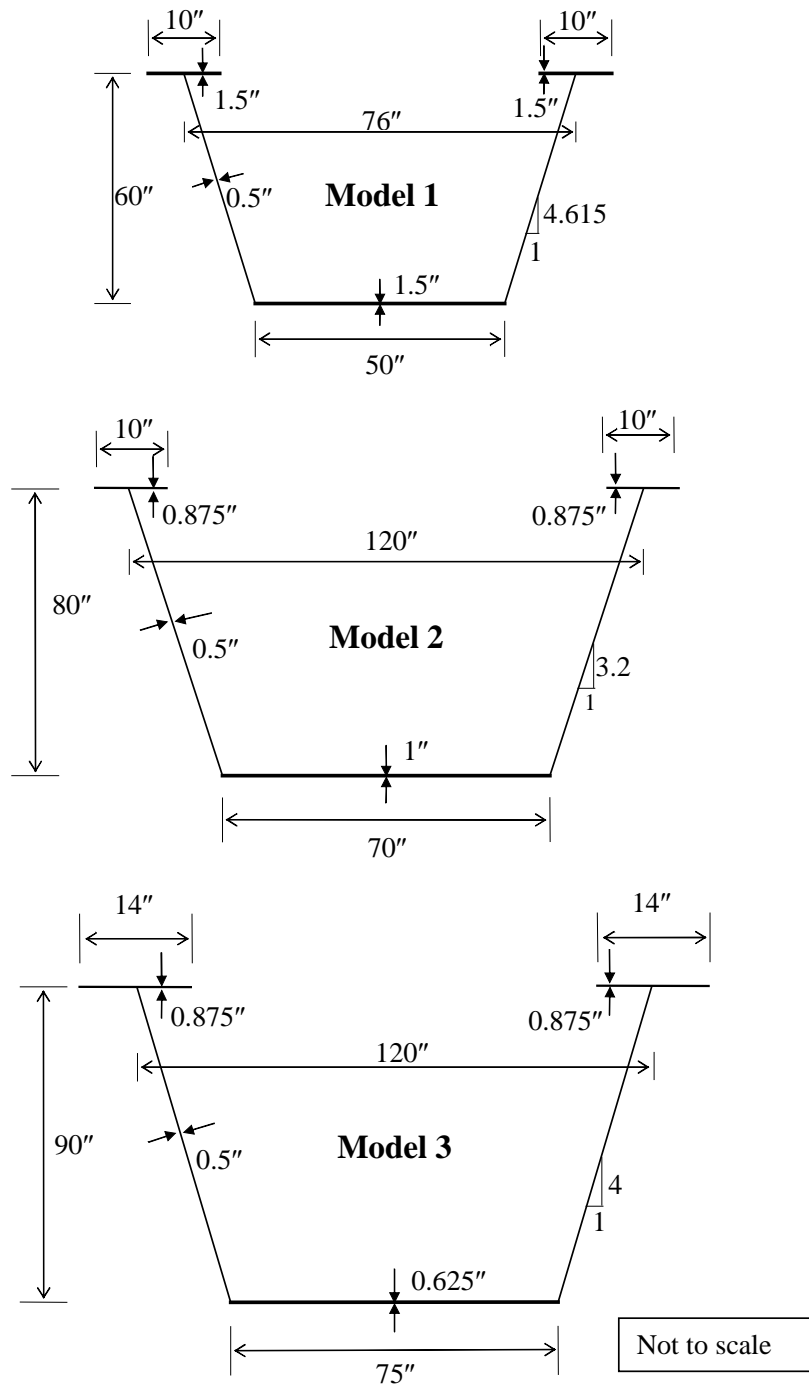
Cross-section dimensions of trapezoidal box girder models
